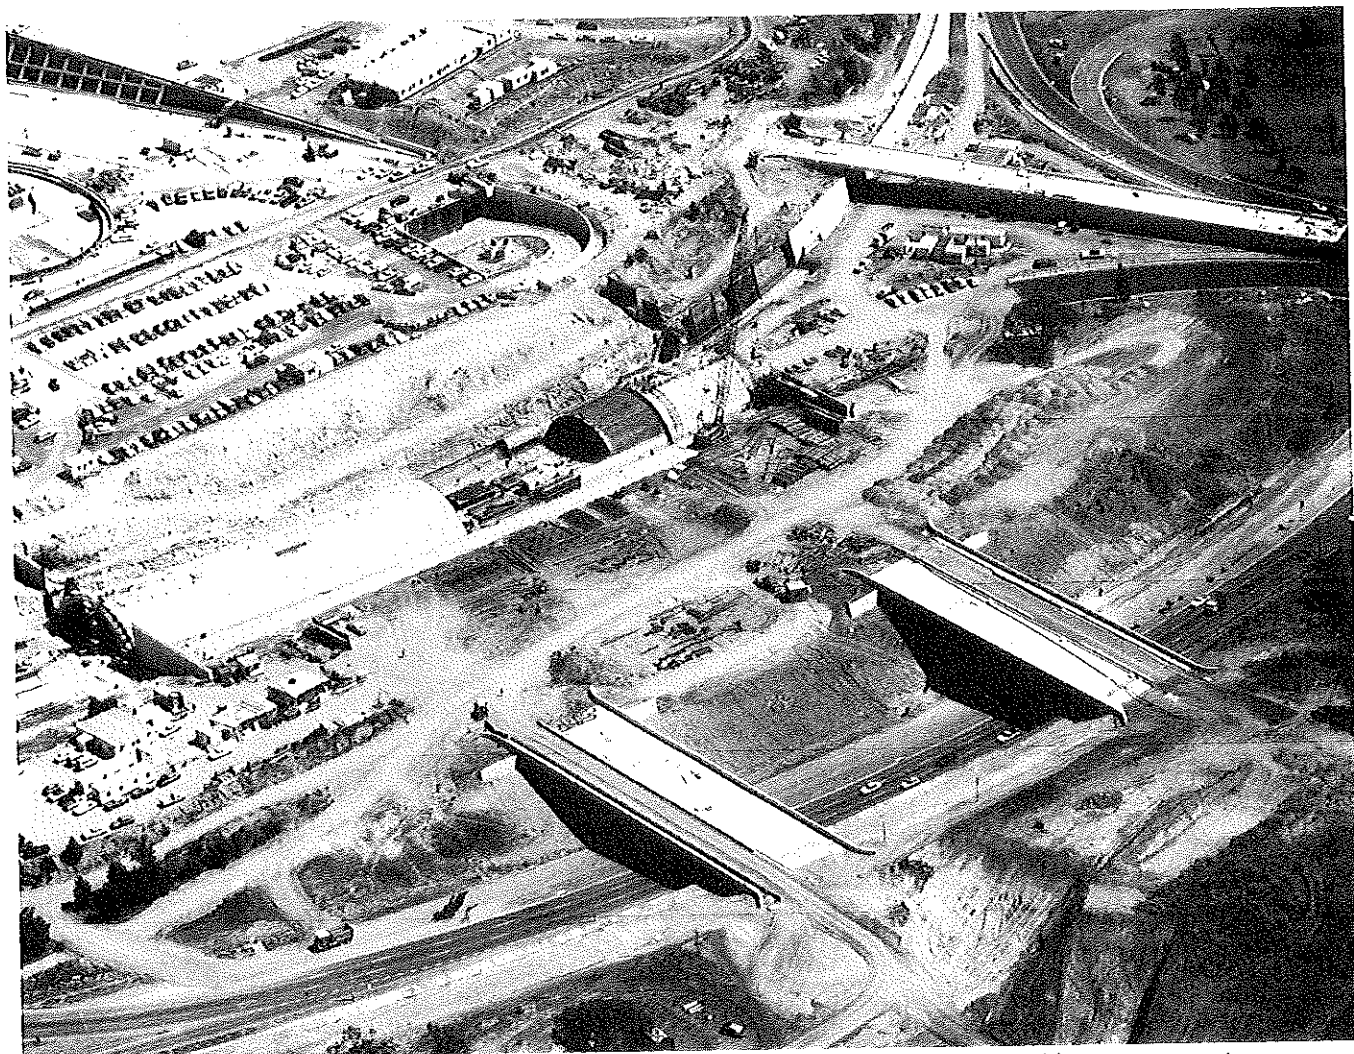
Aerial view of construction in progress on tunnel, Land Axis bridges and Commonwealth Avenue extension.
